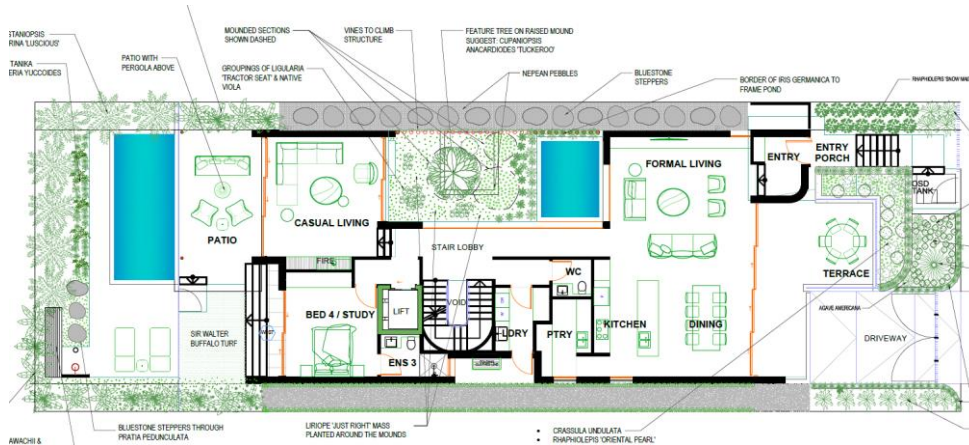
Proposed ground floor landscape plan - 61 The Corso, Maroubra (Source: Bell Landscapes)
